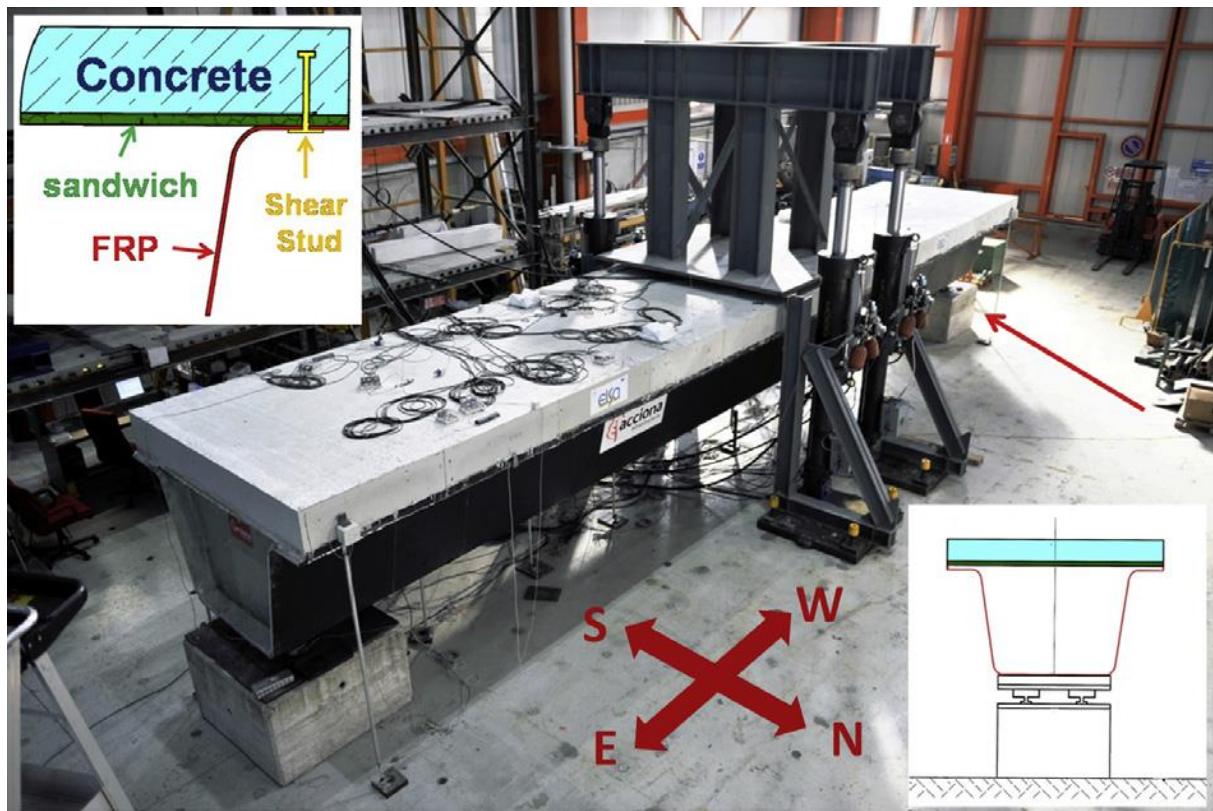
The detail layer of the beam's cross-section and the loading set up (Capéran et al. 2011)
